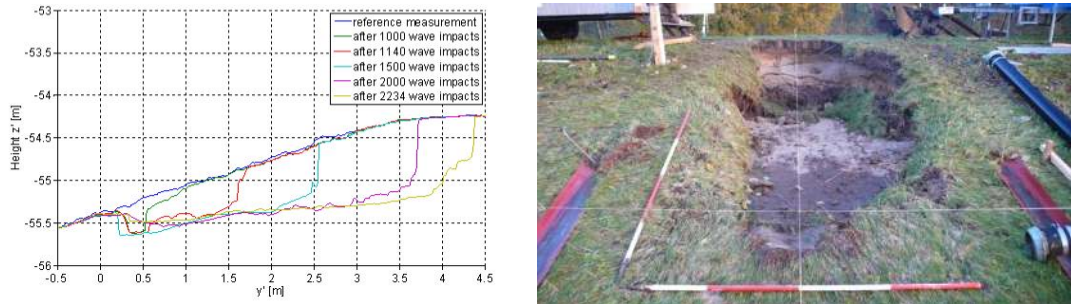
Test Section Be.1. Left: erosion development, right: test section after 2234 impacts.
